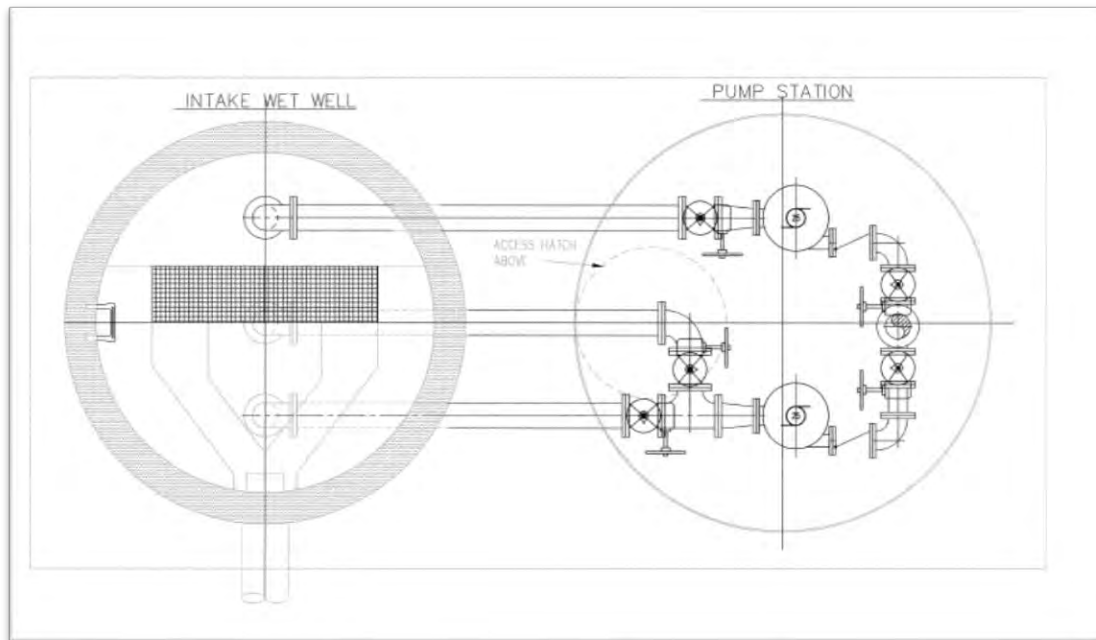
Pump Station Plan View from Willowbend Pump Station Improvements, SS#307, Poggemeyer Design Group, 2008
